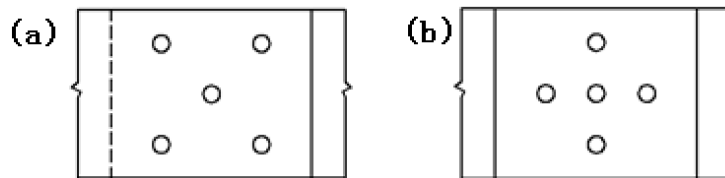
Specimens using five rivets: a) 1.5-5-E2-N1-3d-3d, b) 1.5-5-E1-N3-3d-3d
